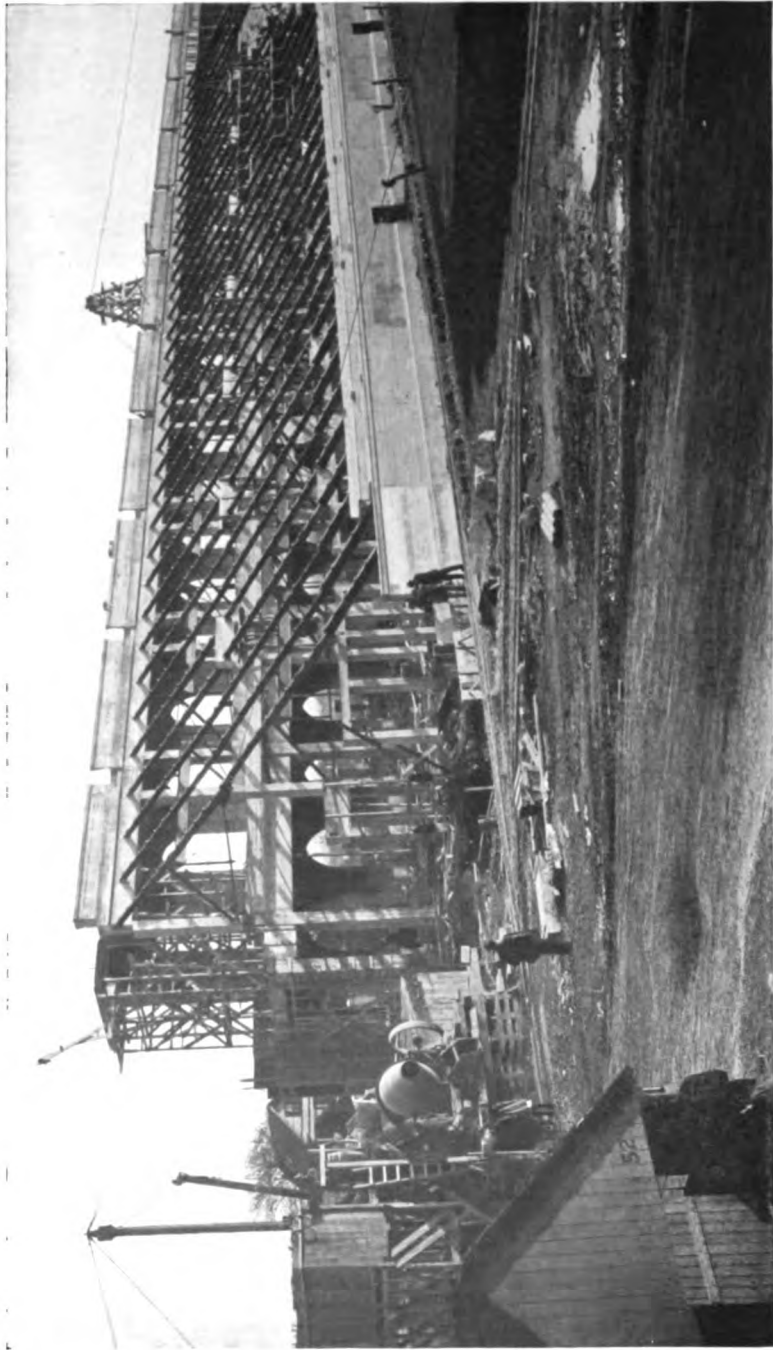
WEST WING UNDER CONSTRUCTION. — CONCRETE MIXER AT THE LEFT.
